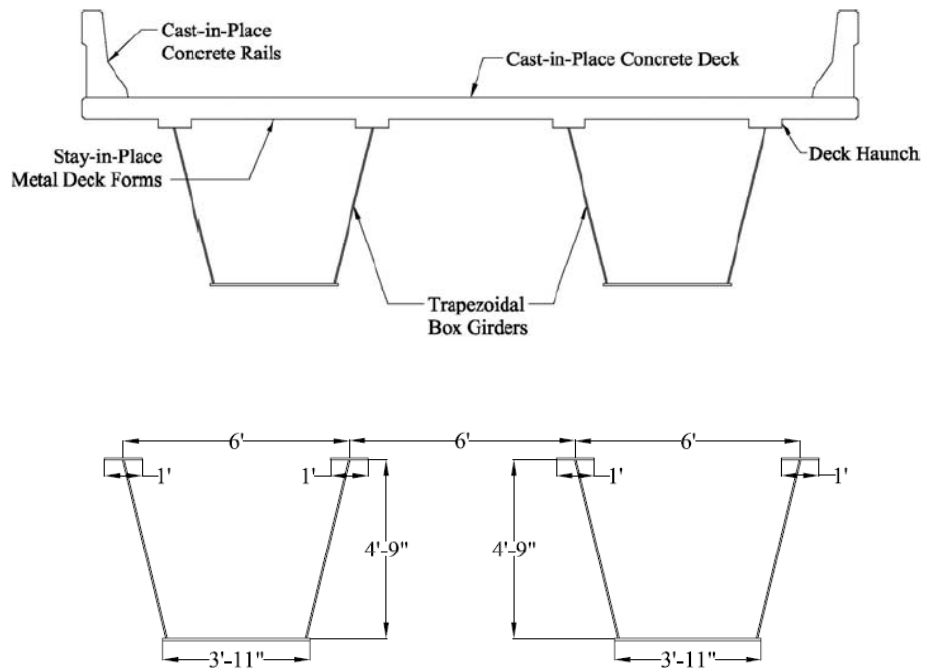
Elevation and cross-section of twin steel box-girder bridge (Hovell, 2007)
